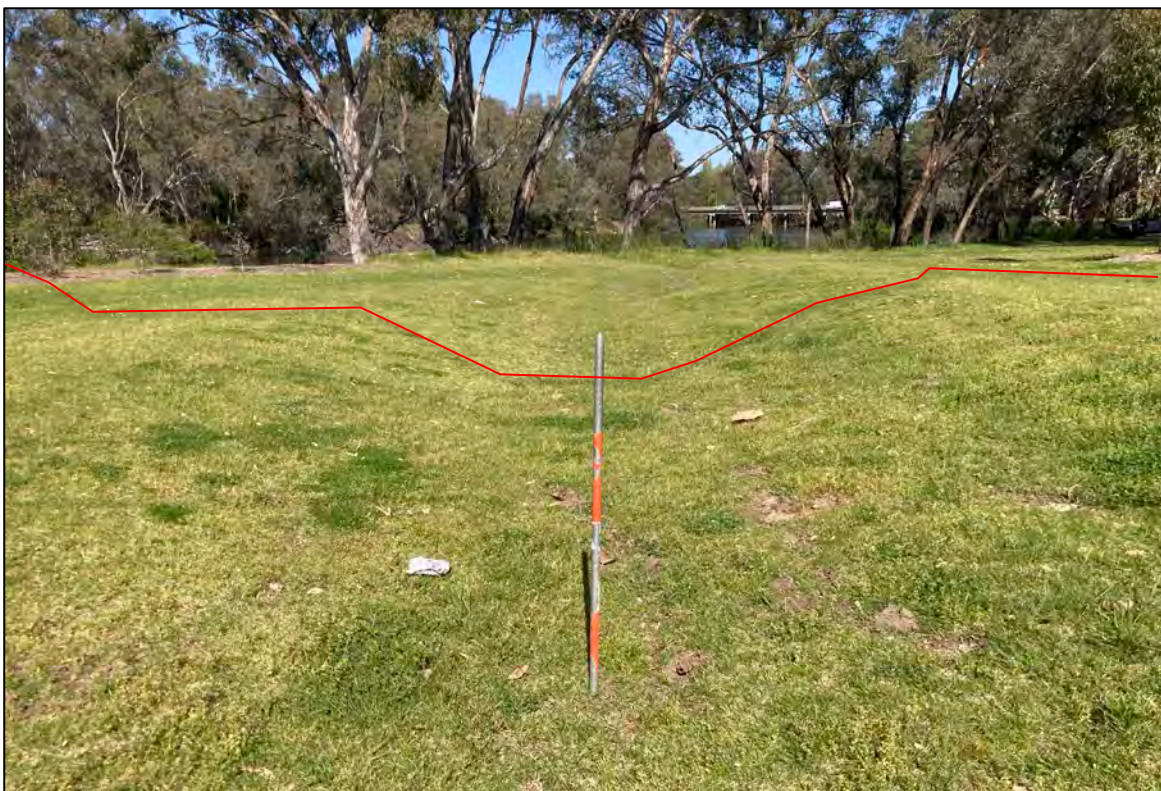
Existing swale drain, mown exotic grass on north bank, mid-section, west orientation. Poor GSV: Photo: D.Wall, 2024.
